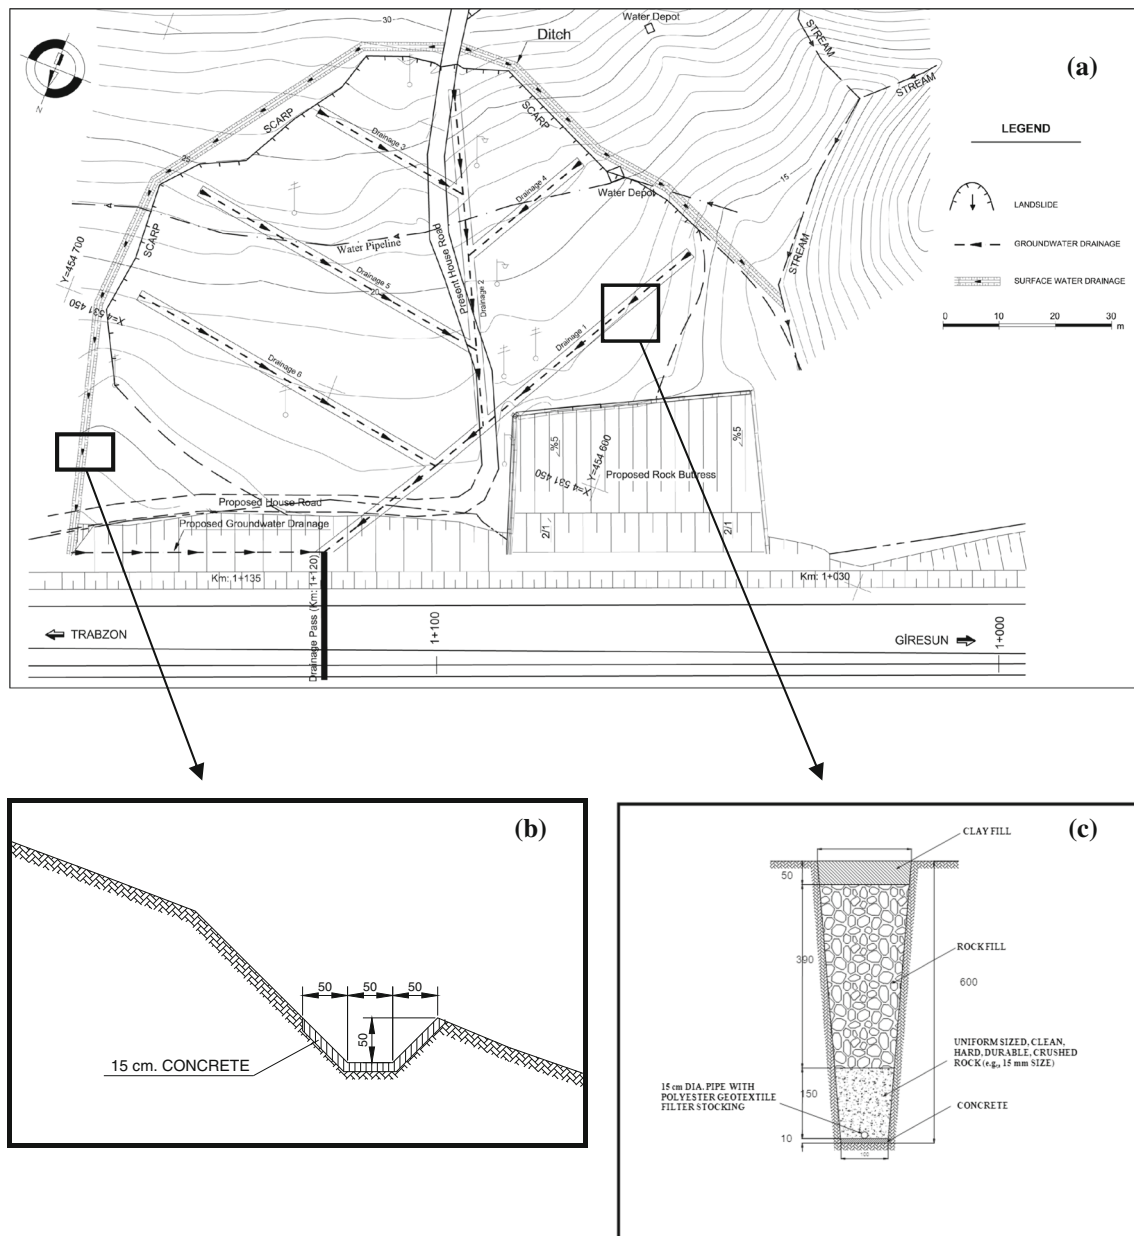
a Slope stabilization applications of the surface water drainage system consisting of a ditch surrounding the displaced material, b the details of the geometry of the ditch (values are in cm)
